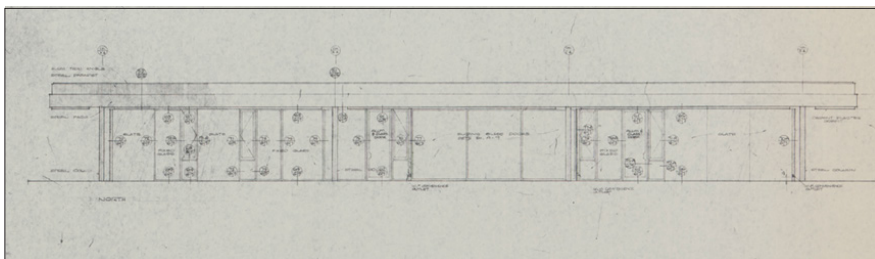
Exterior Elevation. Date: February 18, 1955. Photo credit: MHG\_Illa\_FF041\_013, Miller House and Garden Collection (M003), Newfields Archives
